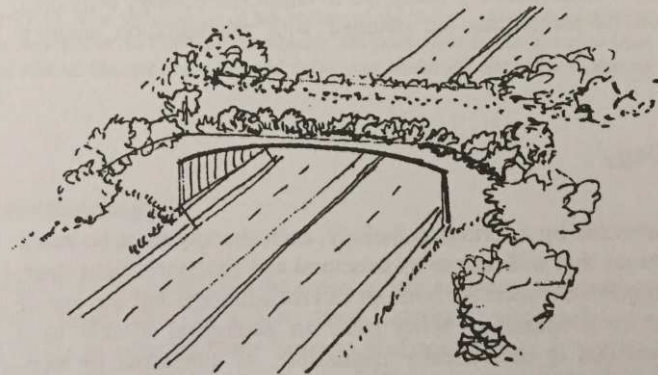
An example of a green bridge crossing a road. These bridge have to be enlarged in their connections with the territory
